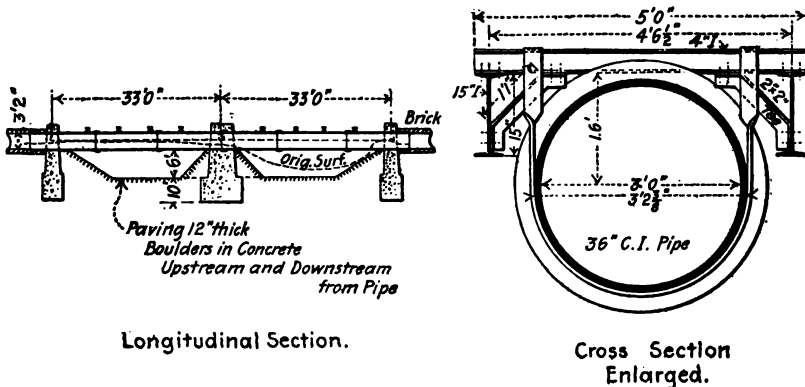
Sewer bridge, joint outlet sewer, New Jersey.
